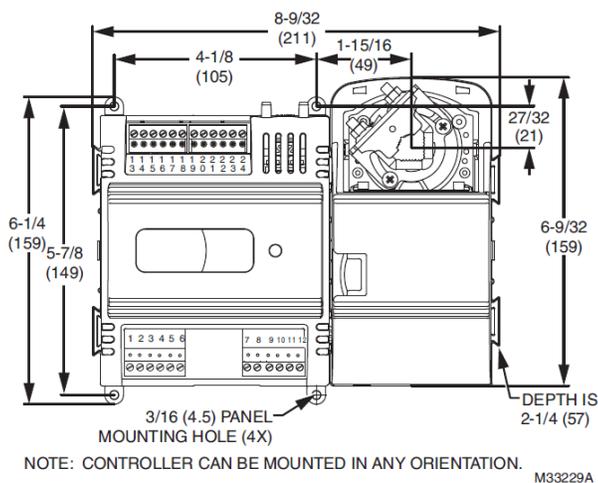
Mounting - controller and actuator dimensions in inches (mm) for CVB4022AS-VAV1 only
